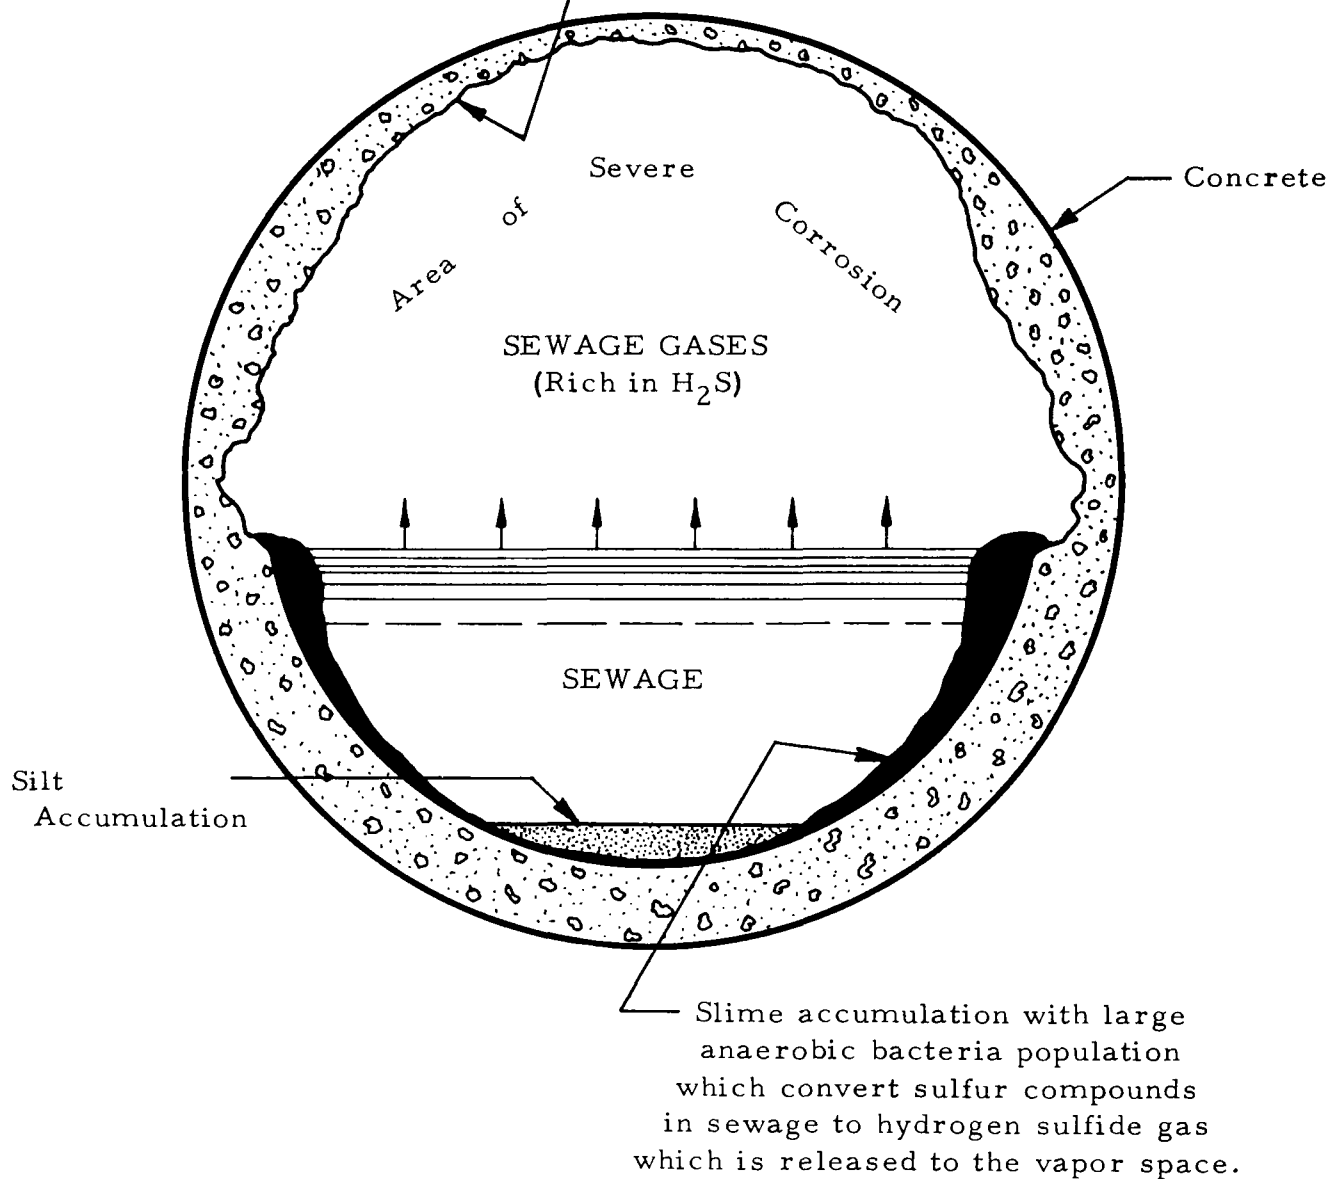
Cross Section of Concrete Sewer Pipe Under Typical Corrosion Conditions.
